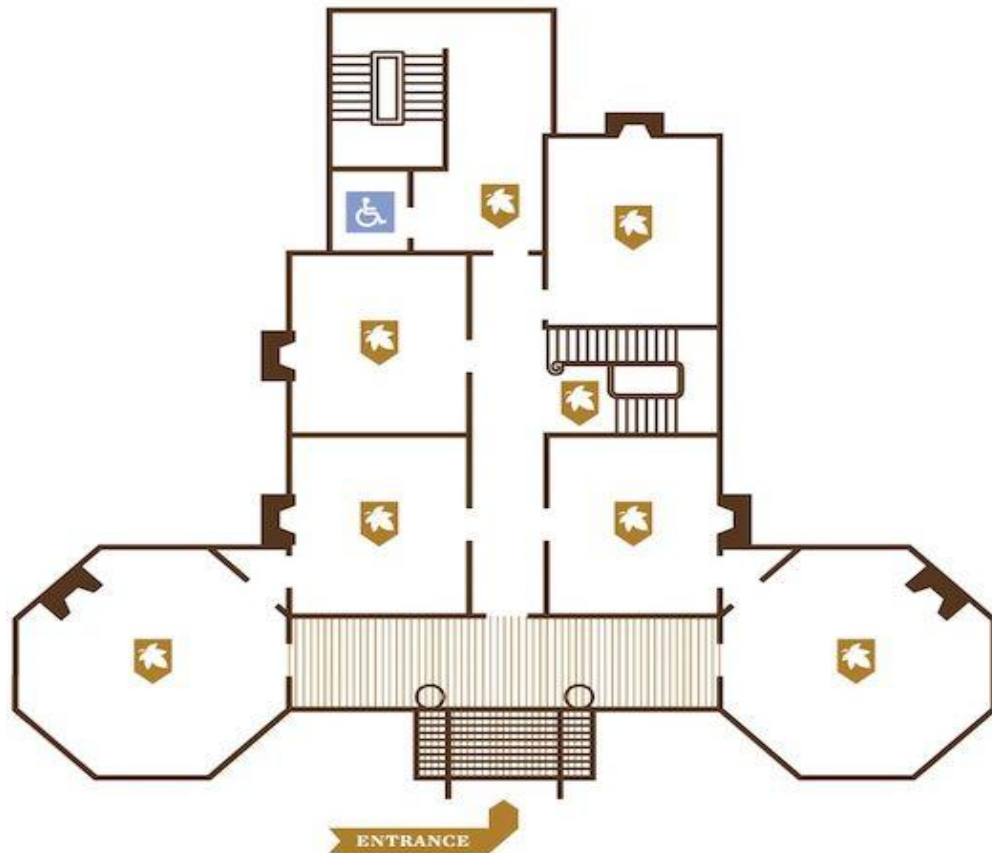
T.R.R. Cobb House Main Floor Plan
